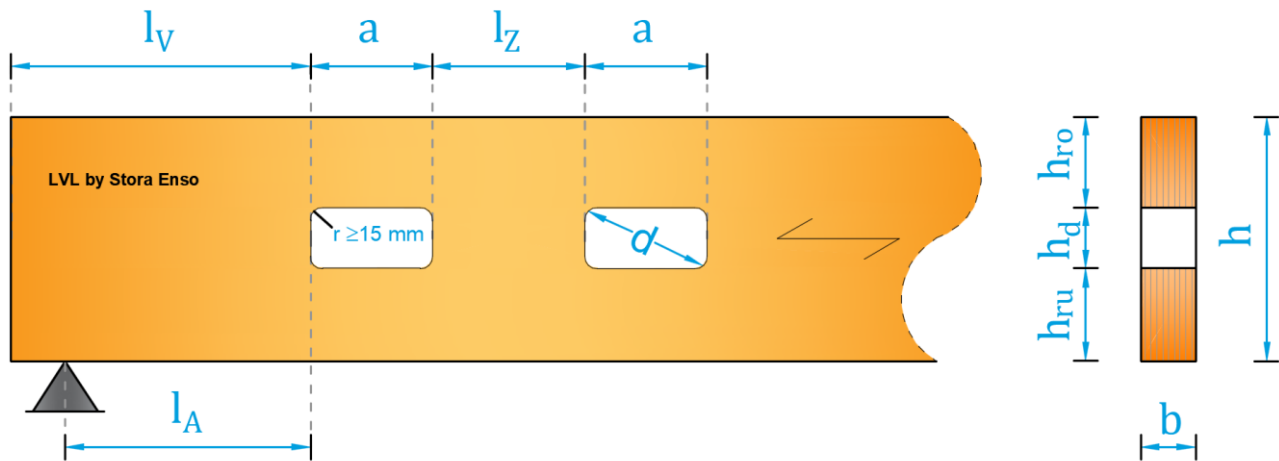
Definitions of geometric dimensions related to rectangular holes.
